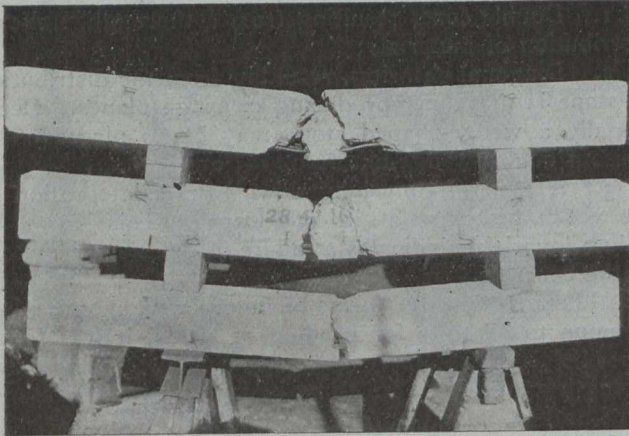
Typical Forms of Failure of Reinforced-Concrete Beams
